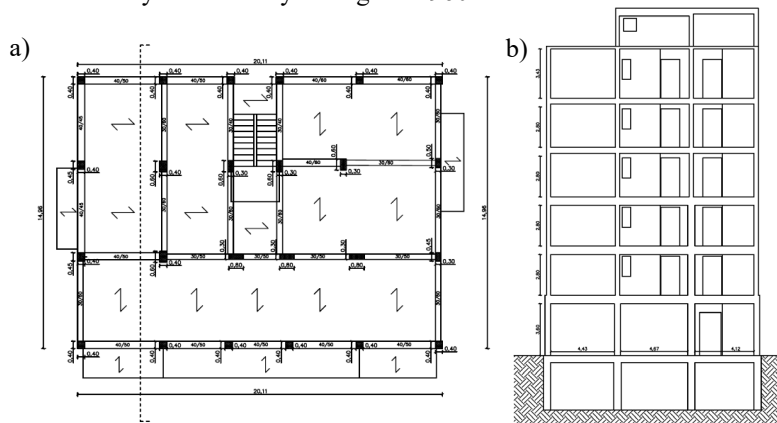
(a) First floor plan and (b) Elevation view of case-study RC building
